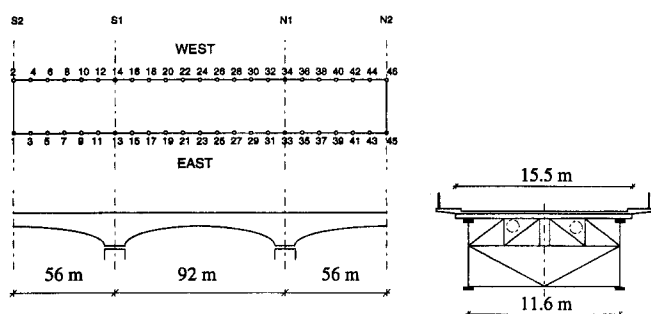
Scheme of Queensborough Bridge—Measurement Points along Its Longitudinal Development and Schematic Section of Steel Girder
